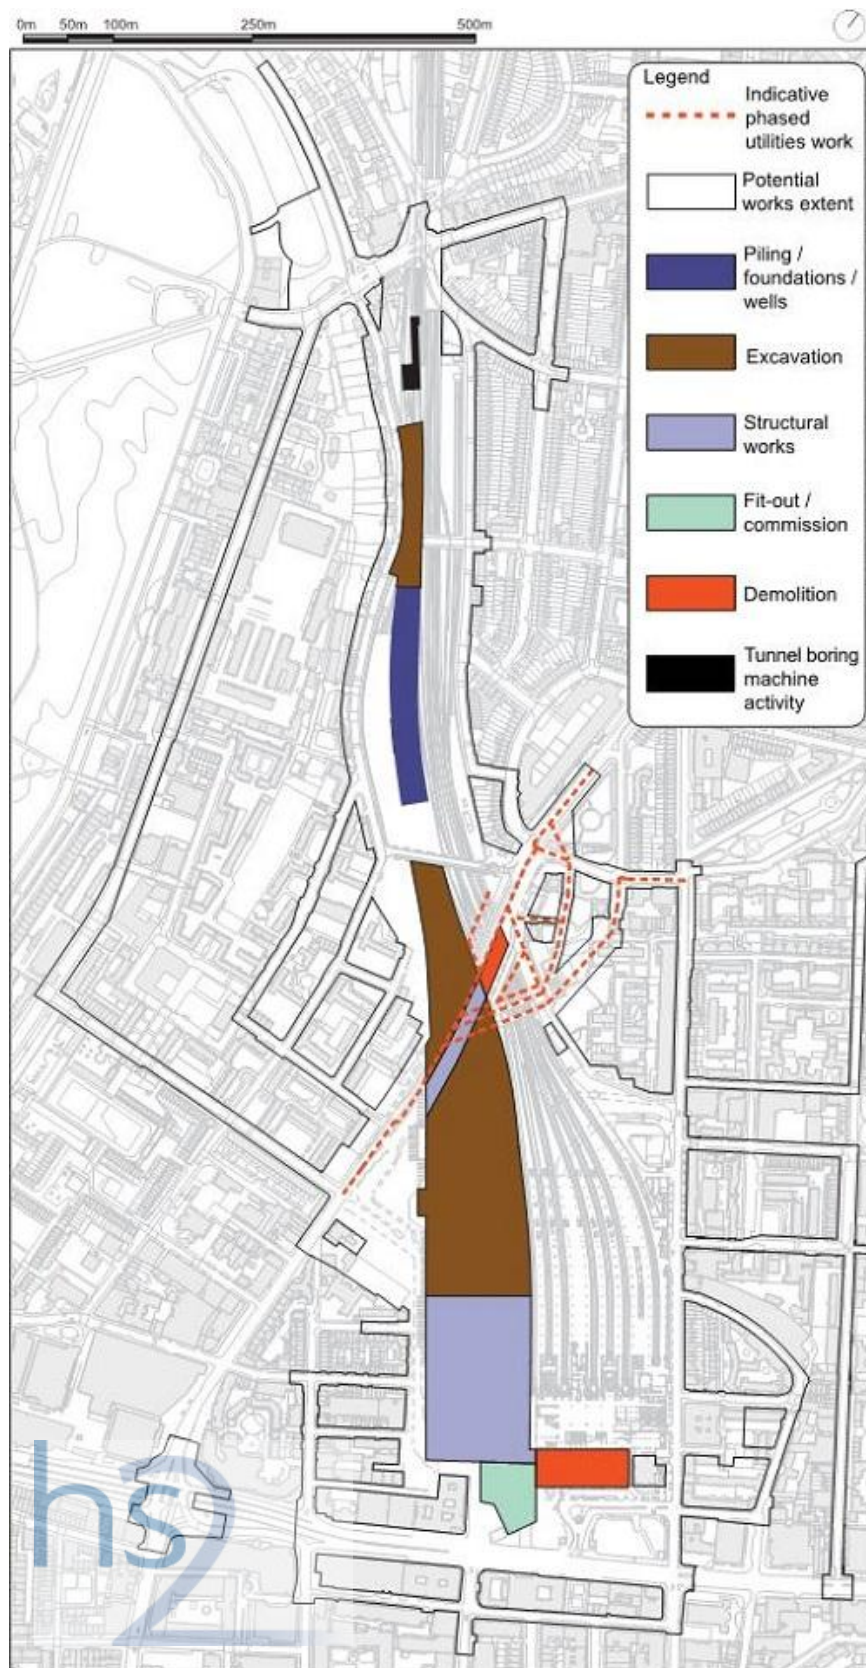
2021 utility, excavation, structural, and fit-out works
